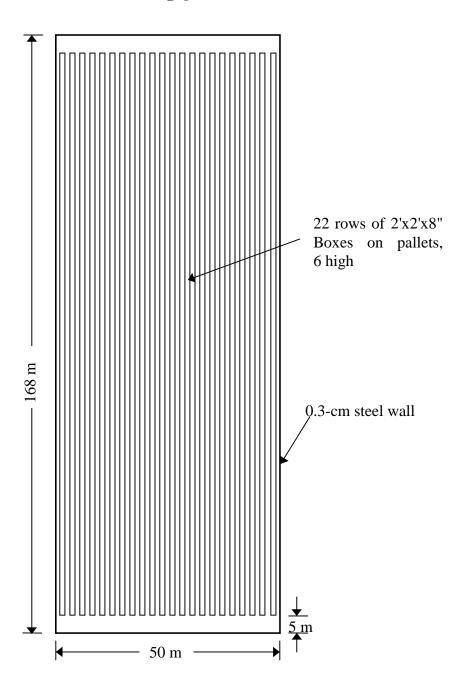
Plan View of a Storage Building with Storage Configuration
